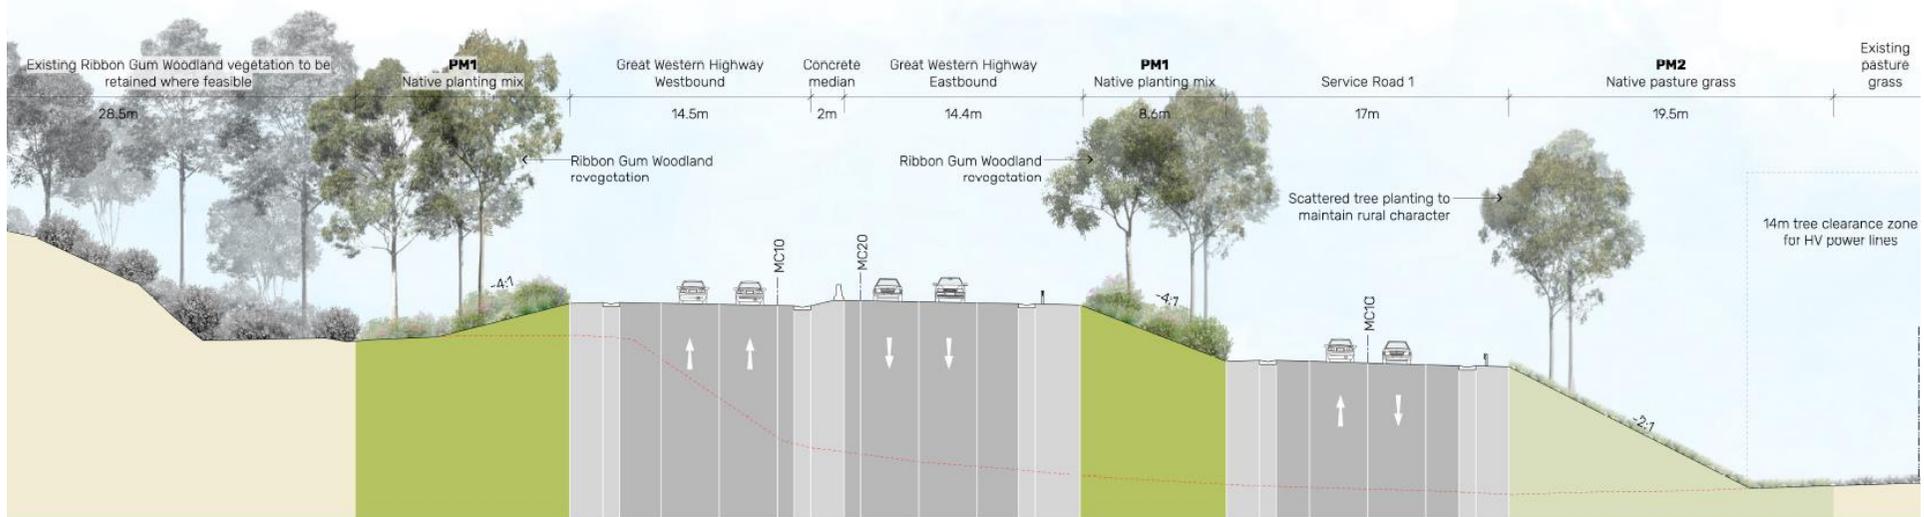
a Typical cross section of the Great Western Highway near Service Road 1
